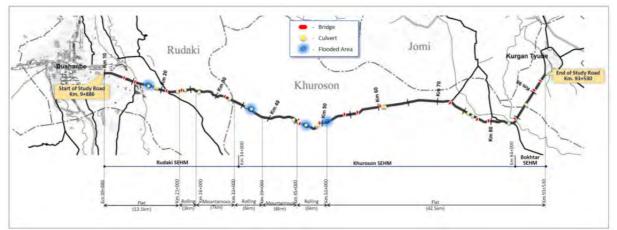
OBSERVED FLOOD ALONG DK ROAD
